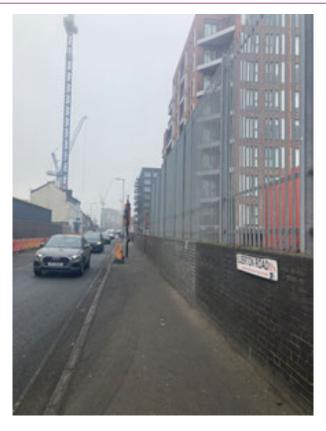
Looking South from the bridge at the junction of Surrey Canal Road and Ilderton Road
